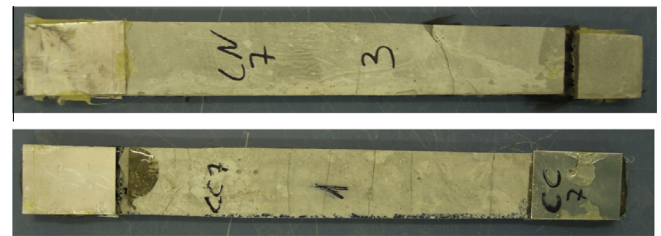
Cracked samples after tensile tests: (a) non-coated and (b) coated of the carbon fabric composites.
